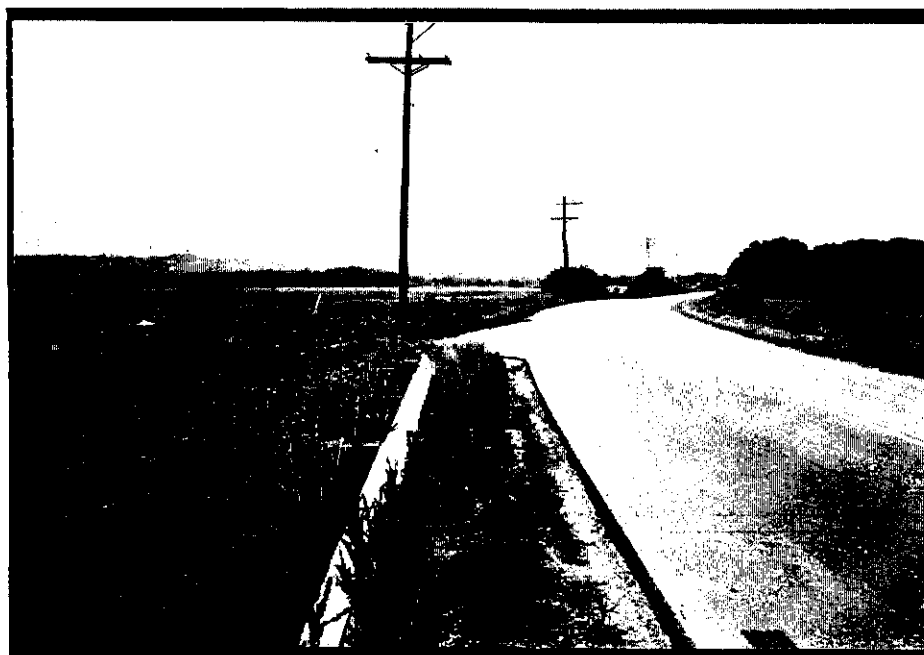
Segment 2, Field B, Site 33Ha697 looking northeast.
